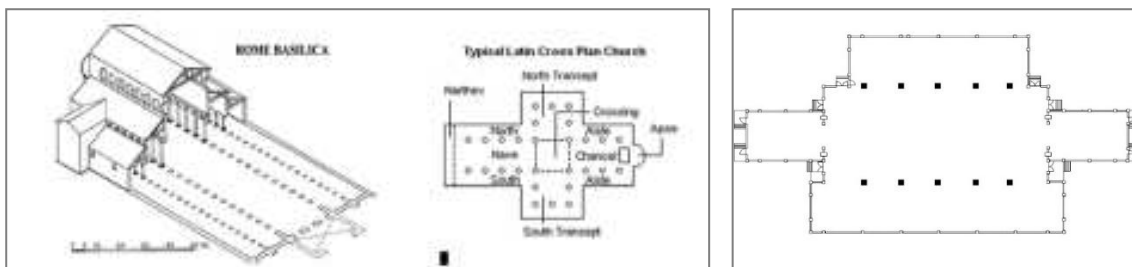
Ground Plan of Rome Basilica (left) [8]; Ground Plan of Barakgebouw A (right) [5]
